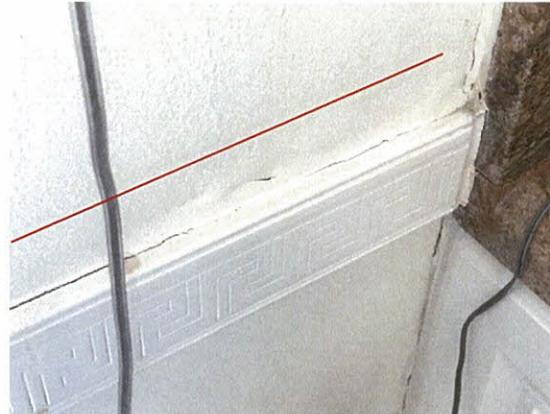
Water intrusion damage at wall trim in the kitchen partition wall from water intrusion from unit above.
